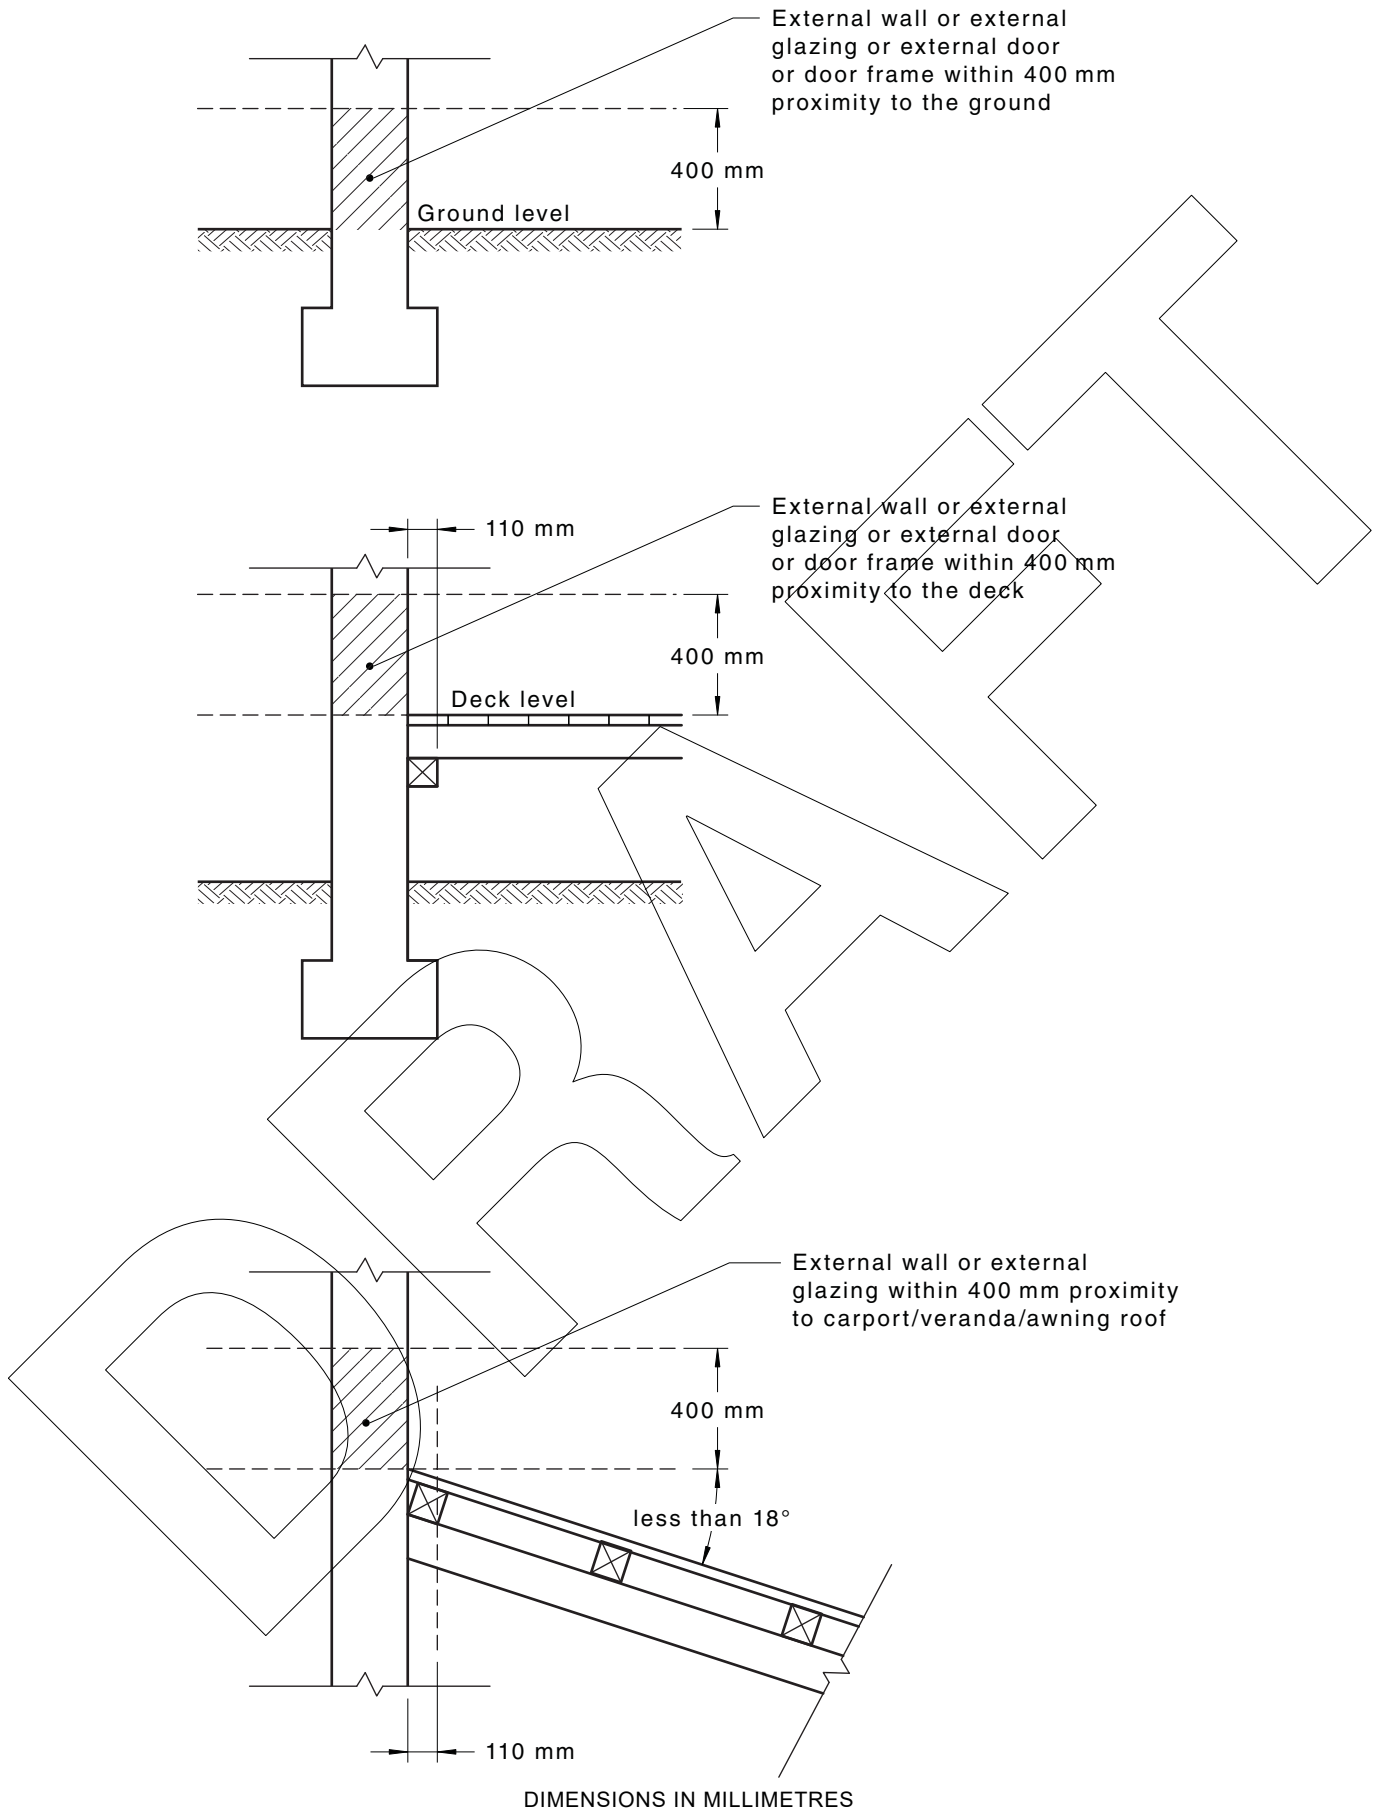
EXTERNAL WALLS OR EXTERNAL GLAZING, OR EXTERNAL DOORFRAMES WITHIN LIMITS ABOVE GROUND, DECKS, CARPORT ROOFS
